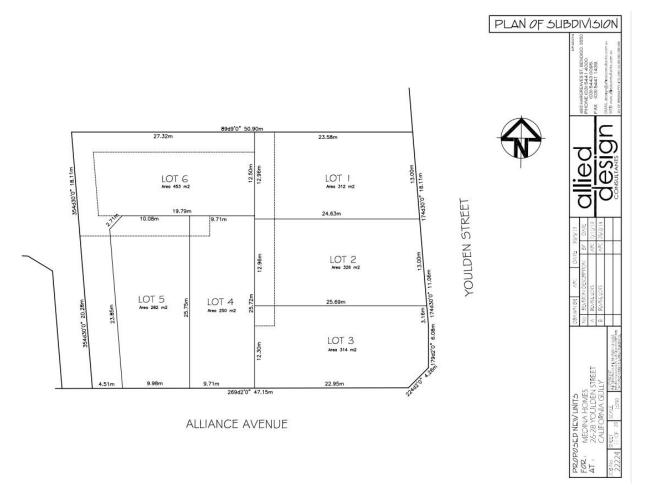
Plan showing layout of six lot subdivision approved by permit DSD/448/2013
